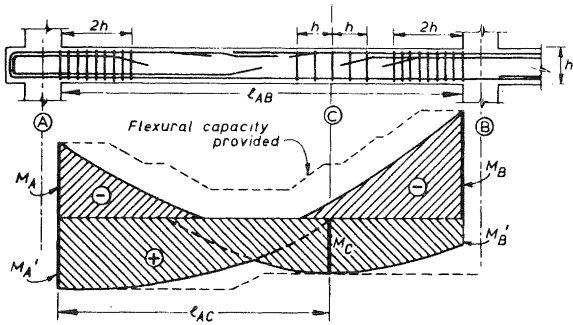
LOCALITIES OF POTENTIAL HINGES WHERE STIRRUP TIES ARE REQUIRED.
